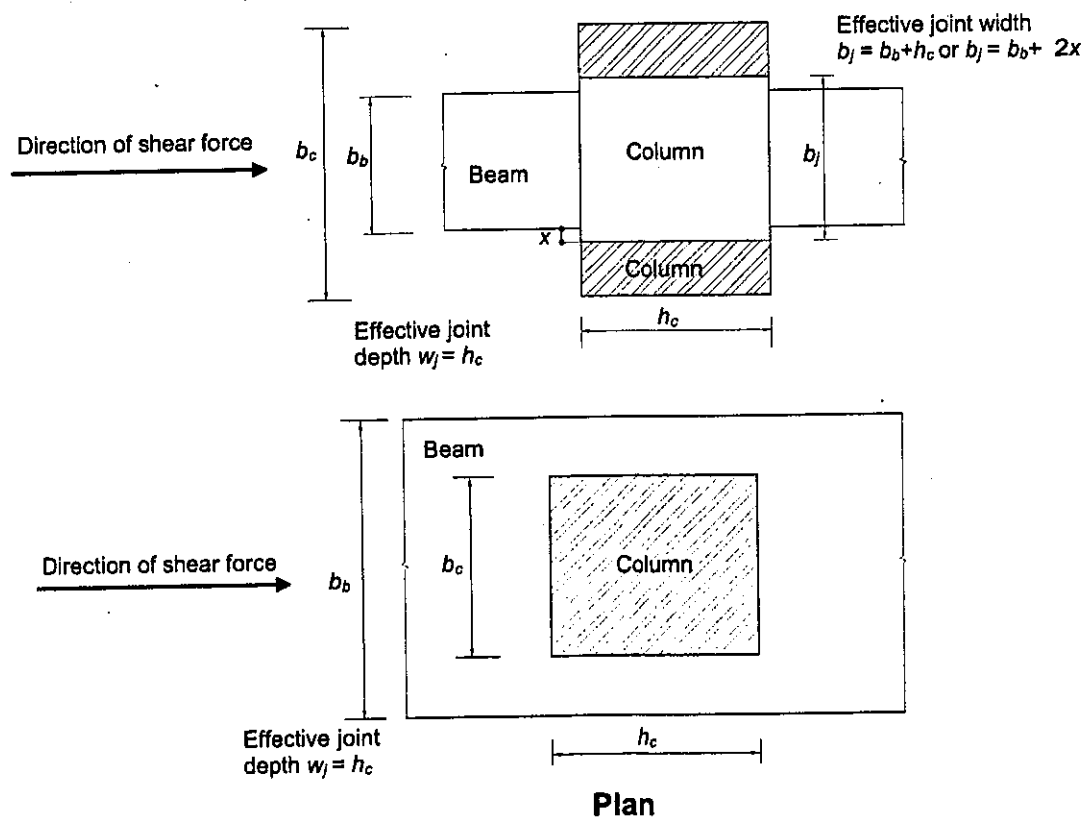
(A) PLAN VIEW OF A BEAM COLUMN JOINT
